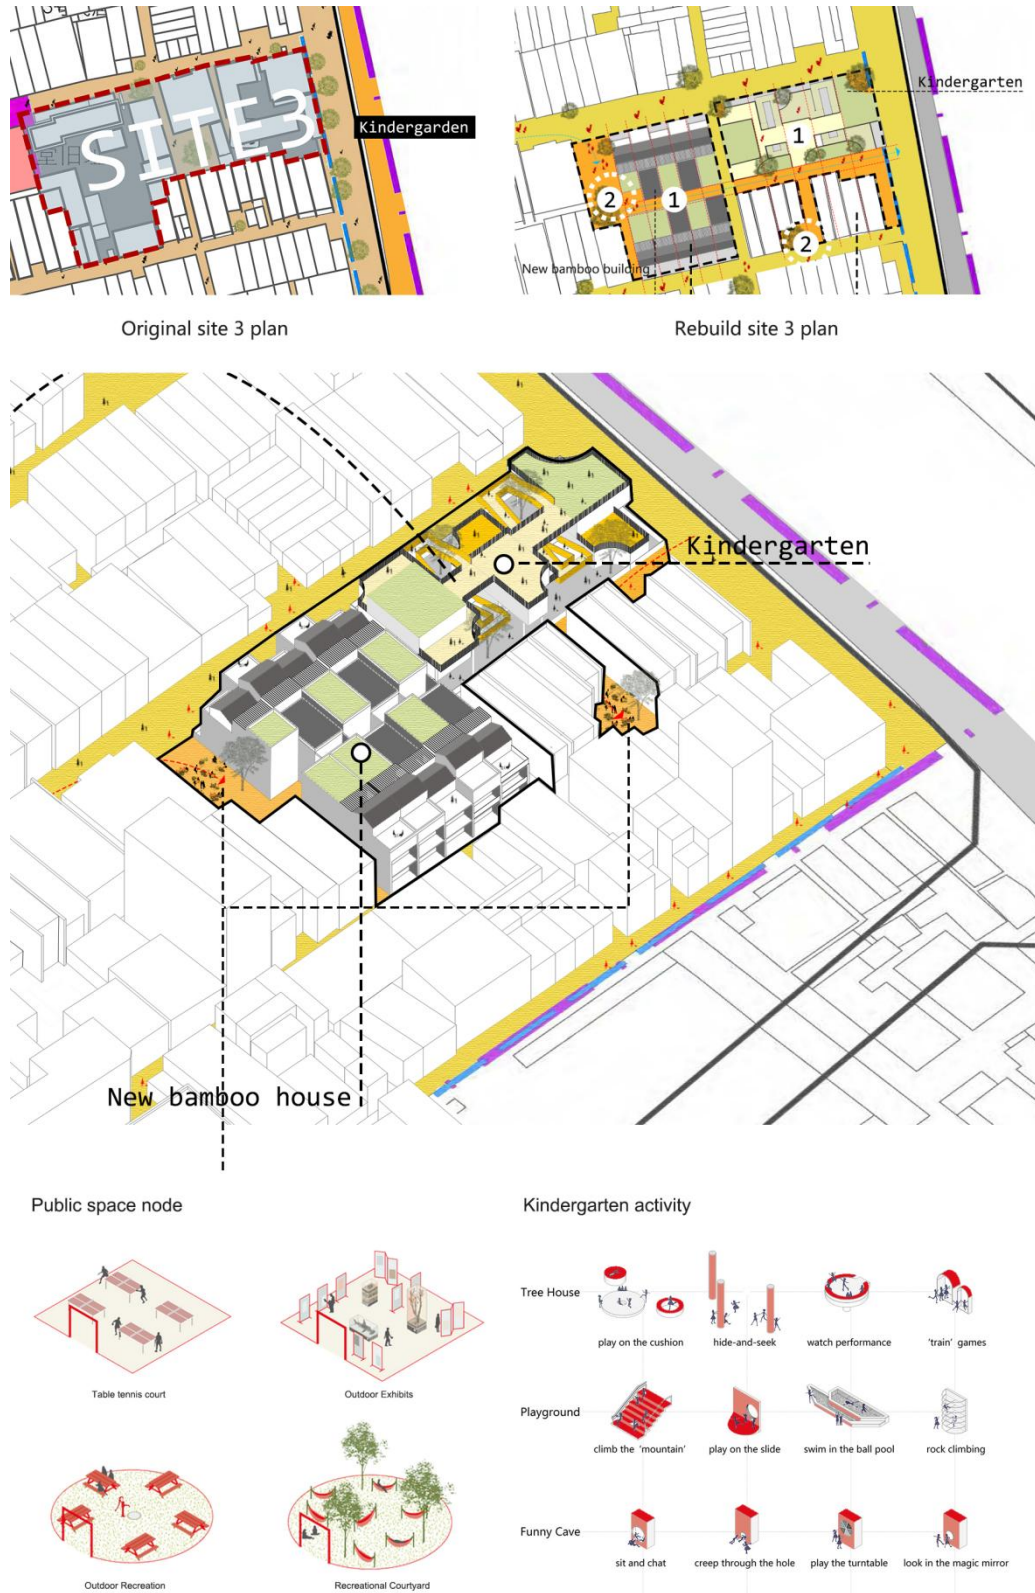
Site 3 plan and public space activities (Source: the author)
